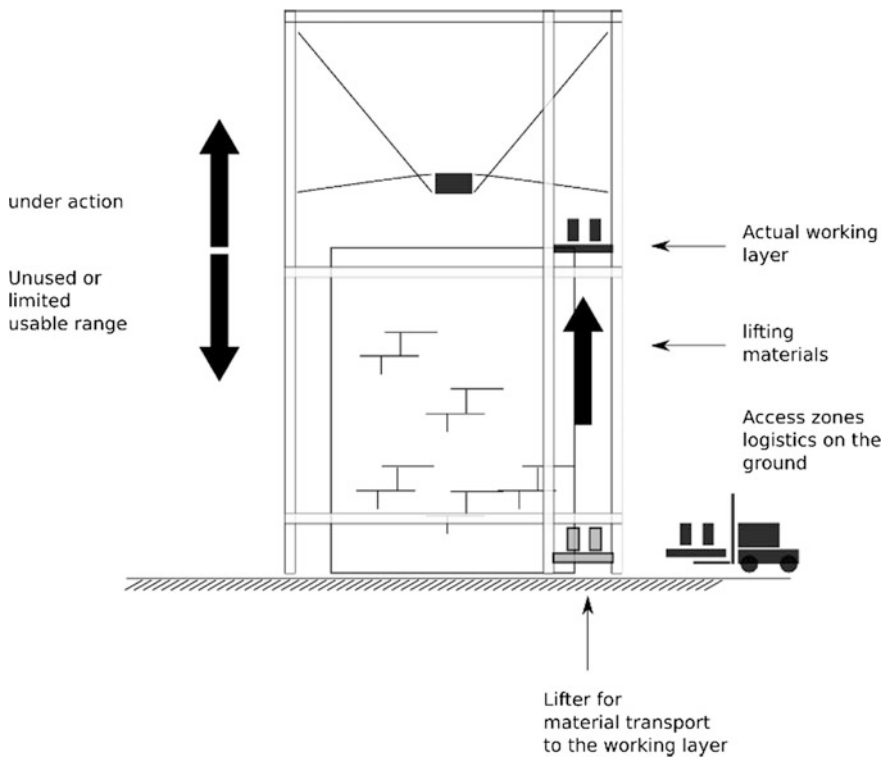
Site view of the site with cable robot, fork lifter, lifter and building
